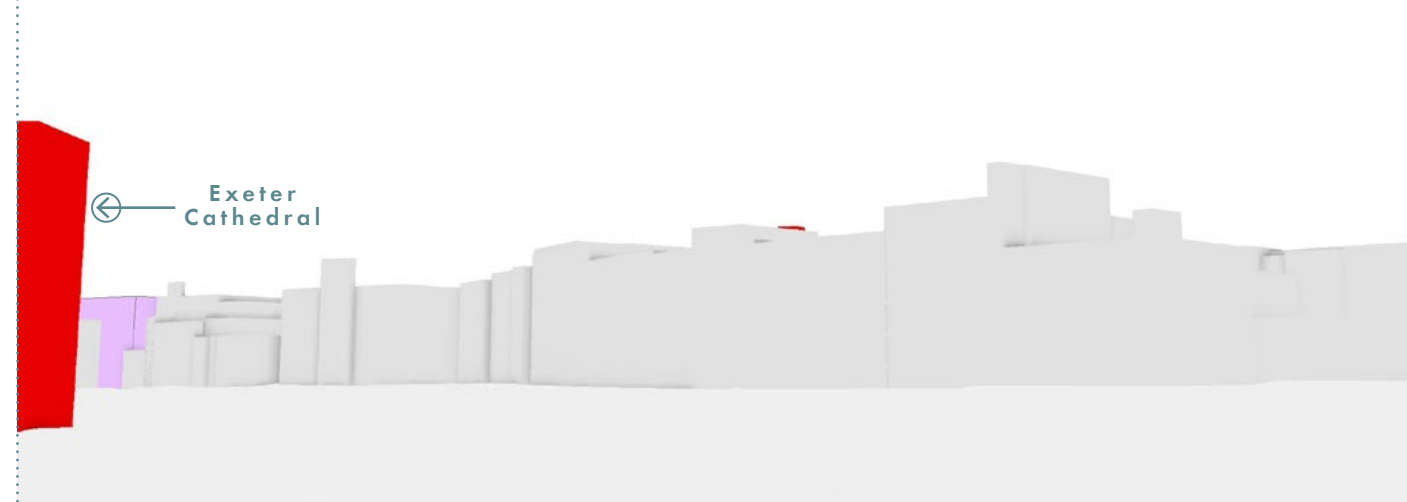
Key View AO1 St David's Hill / Iron Bridge view looking up North Street and towards the city centre and Cathedral towers
